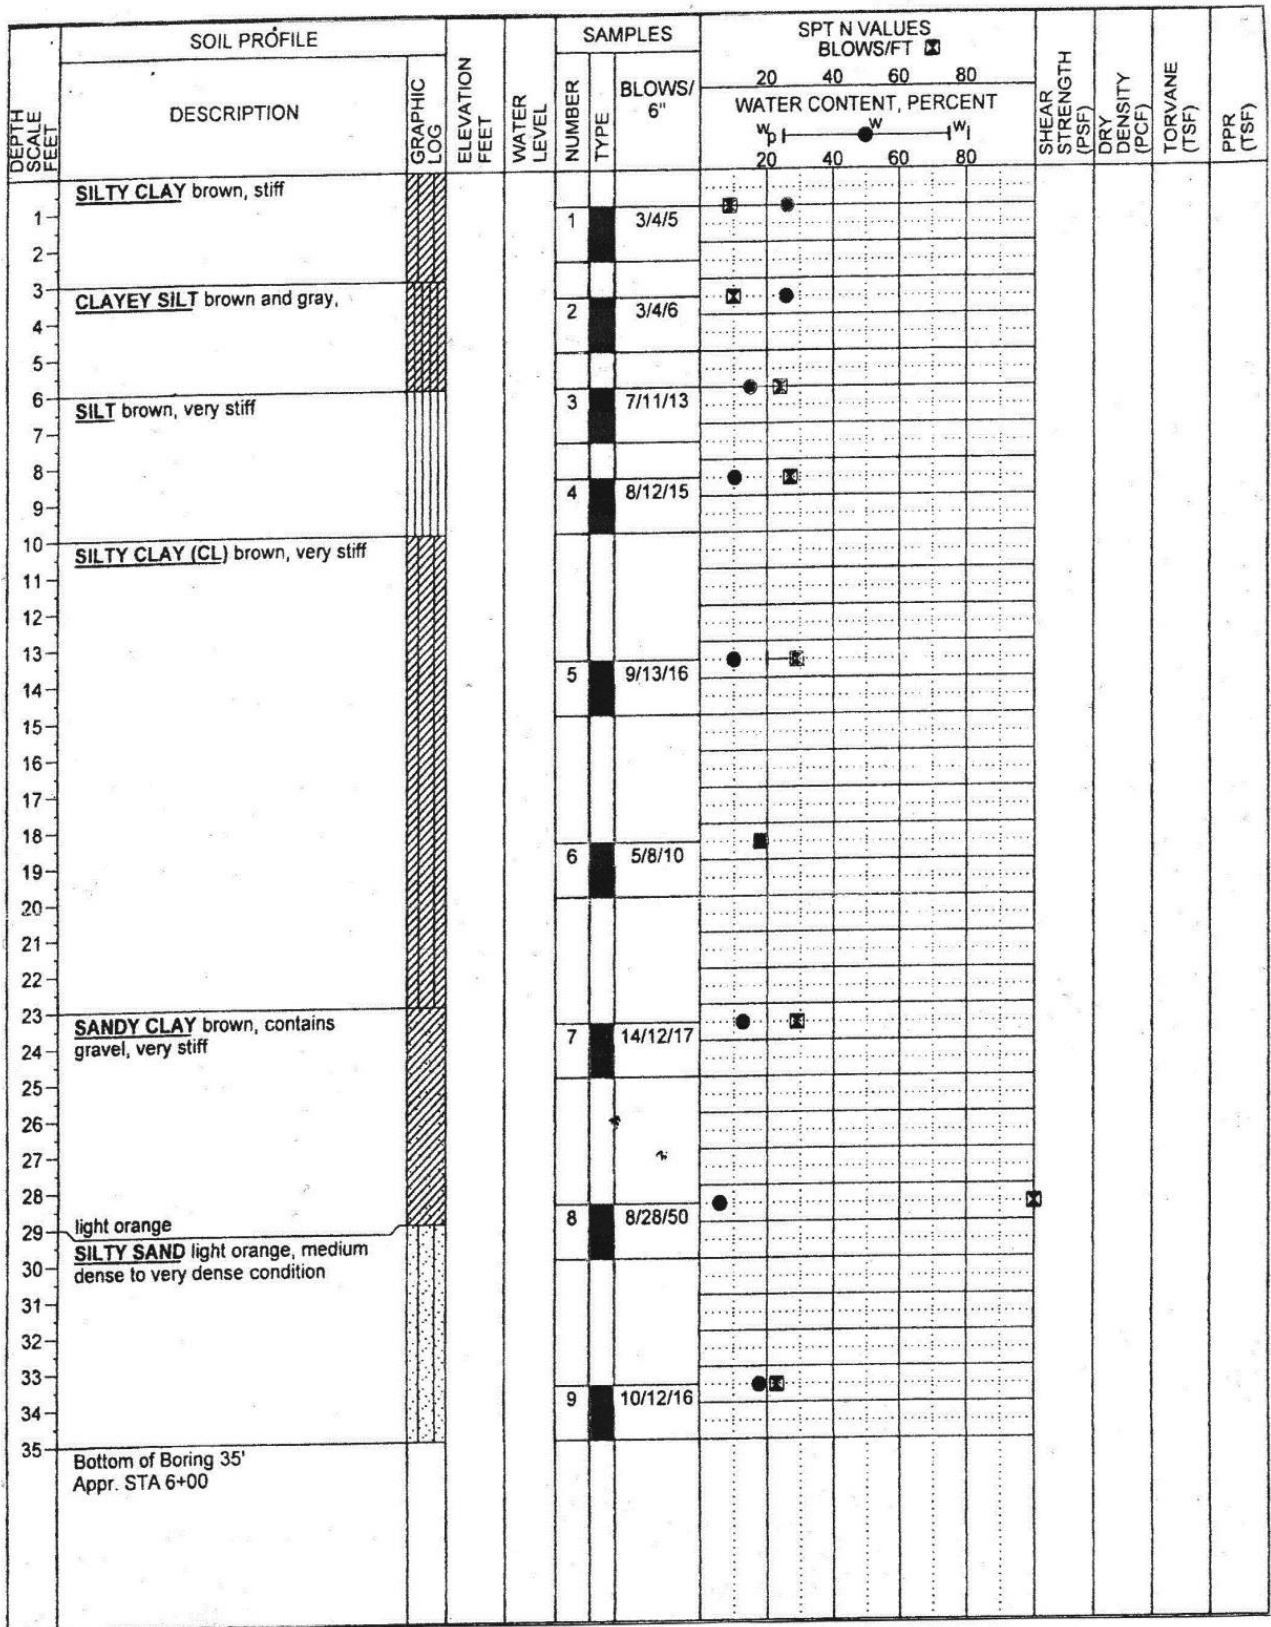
Soil profile at the site of the school building (courtesy of Geotechnology, Inc).
